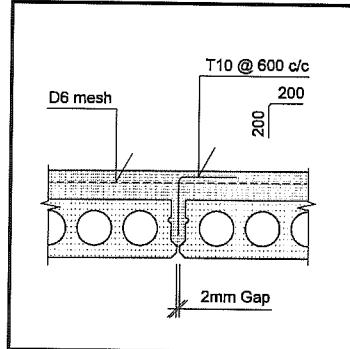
Typical Joint Details Between Hollow Core Slabs
